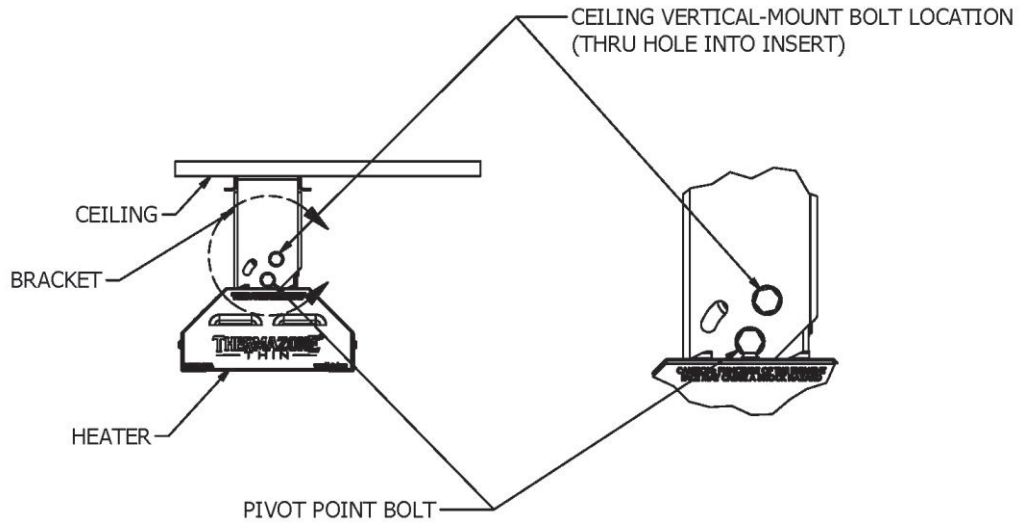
CEILING ONLY VERTICAL MOUNTING POSITIONING
